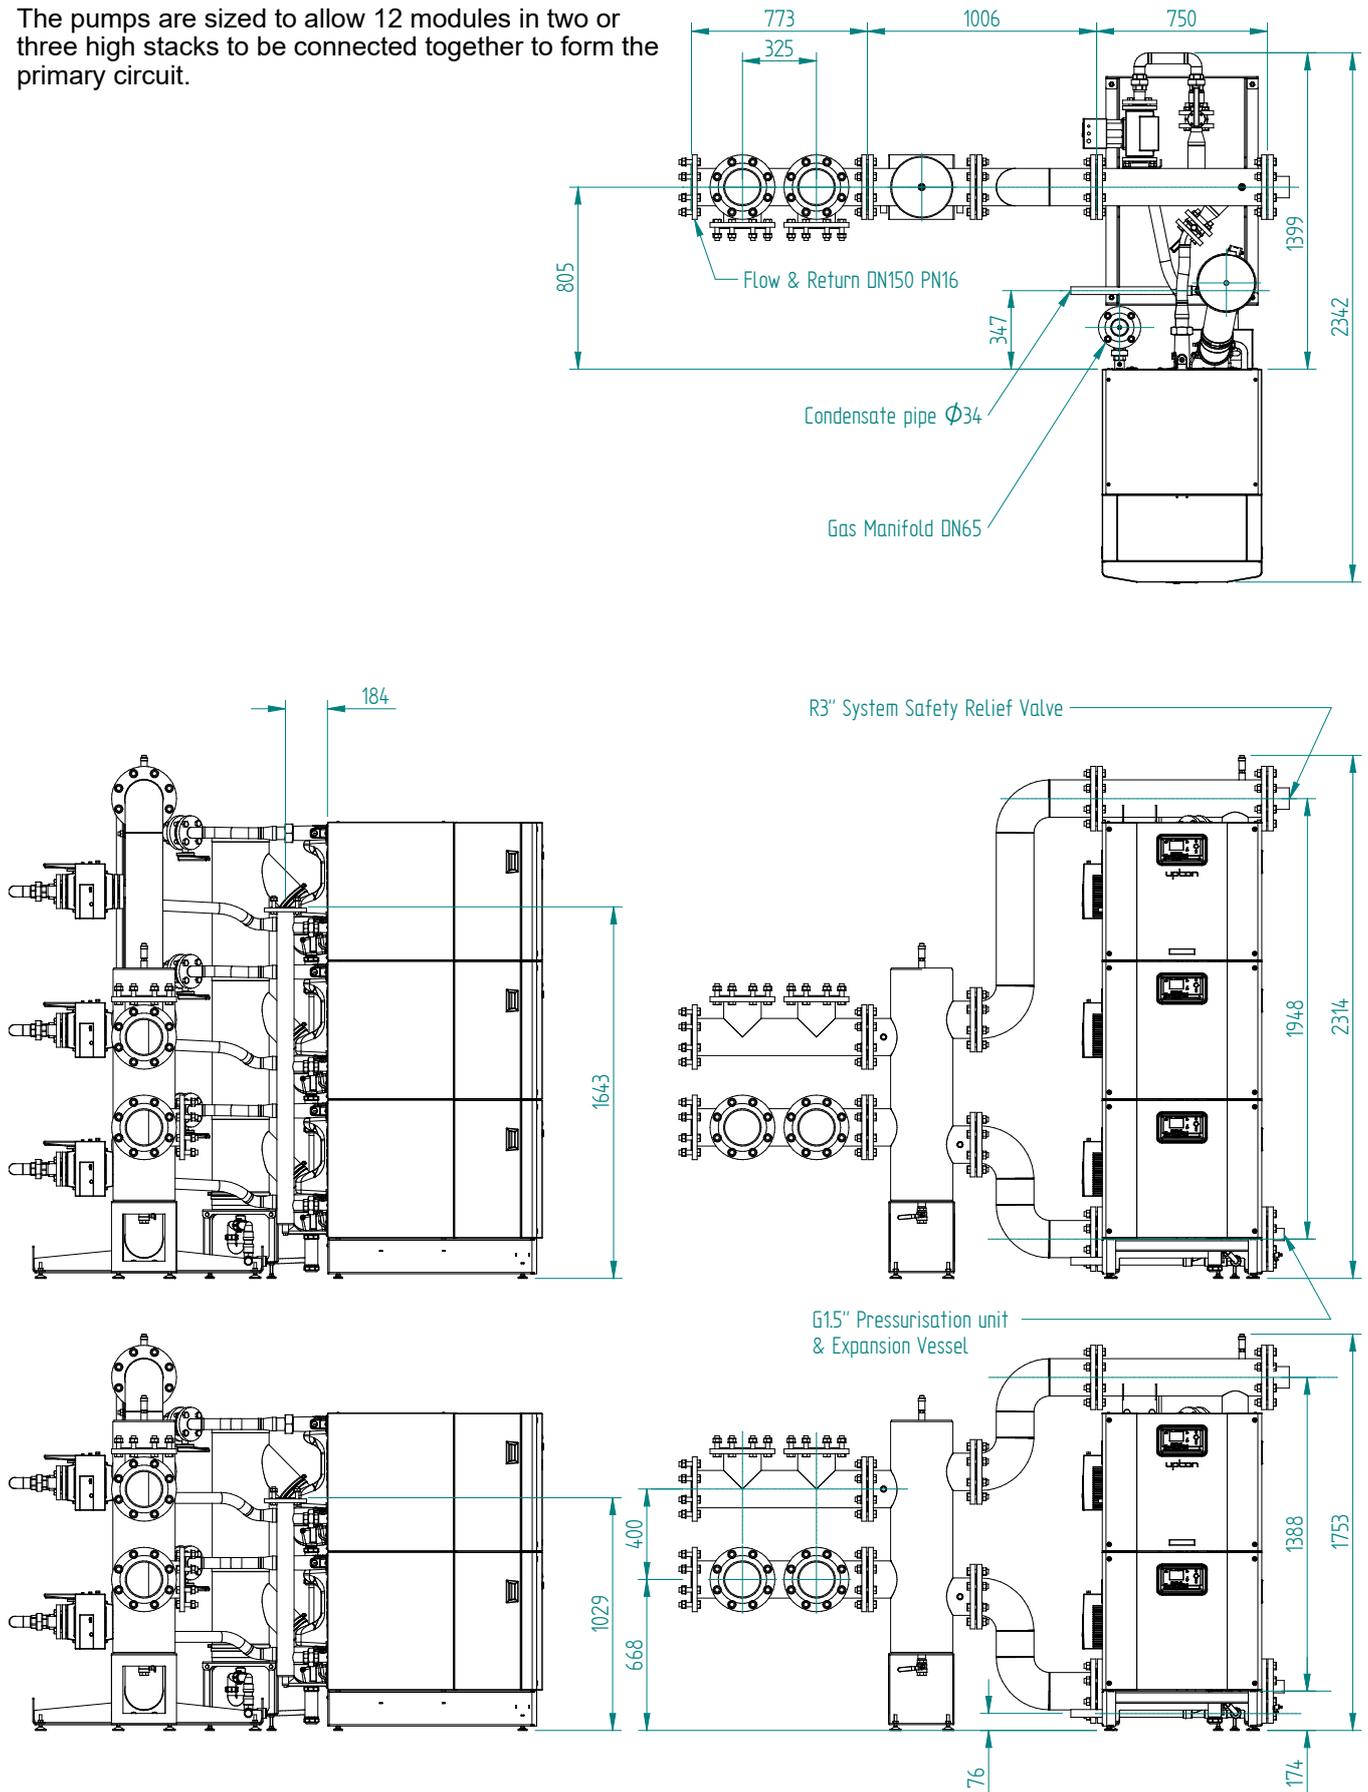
UF200 & UF250 3MW Primary circuit and Gas manifold pipe kit
